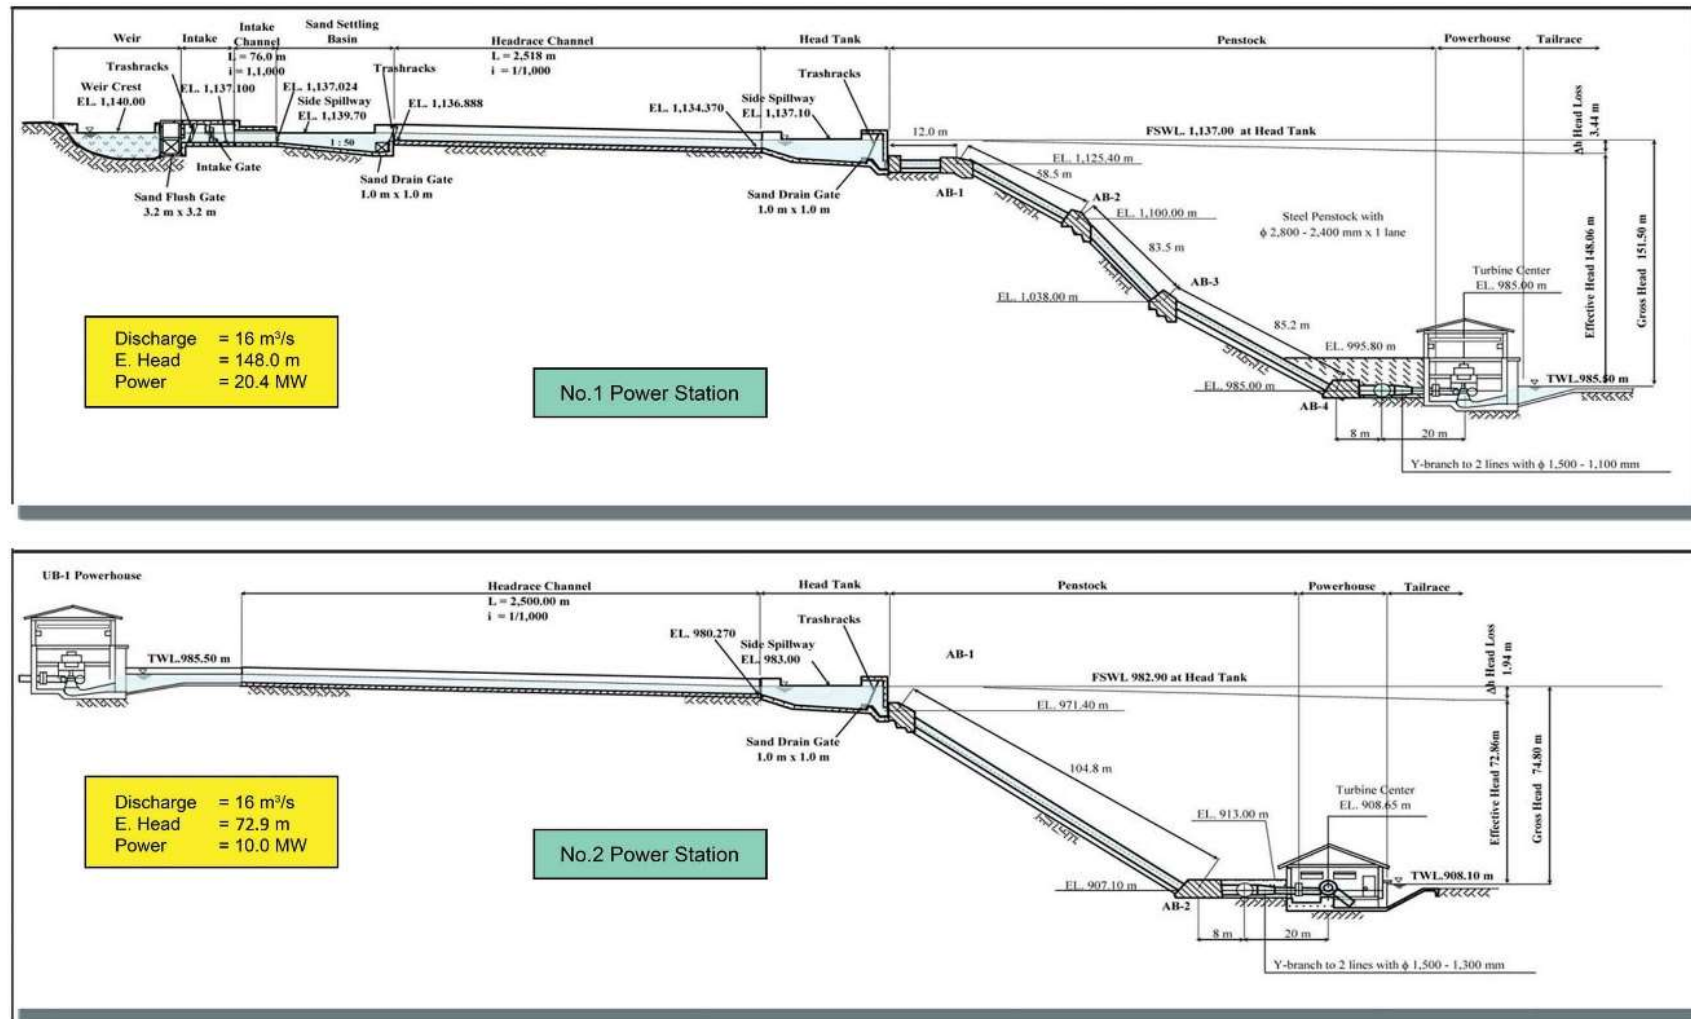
Layout plan of No.1 and No.2 Power Stations.
